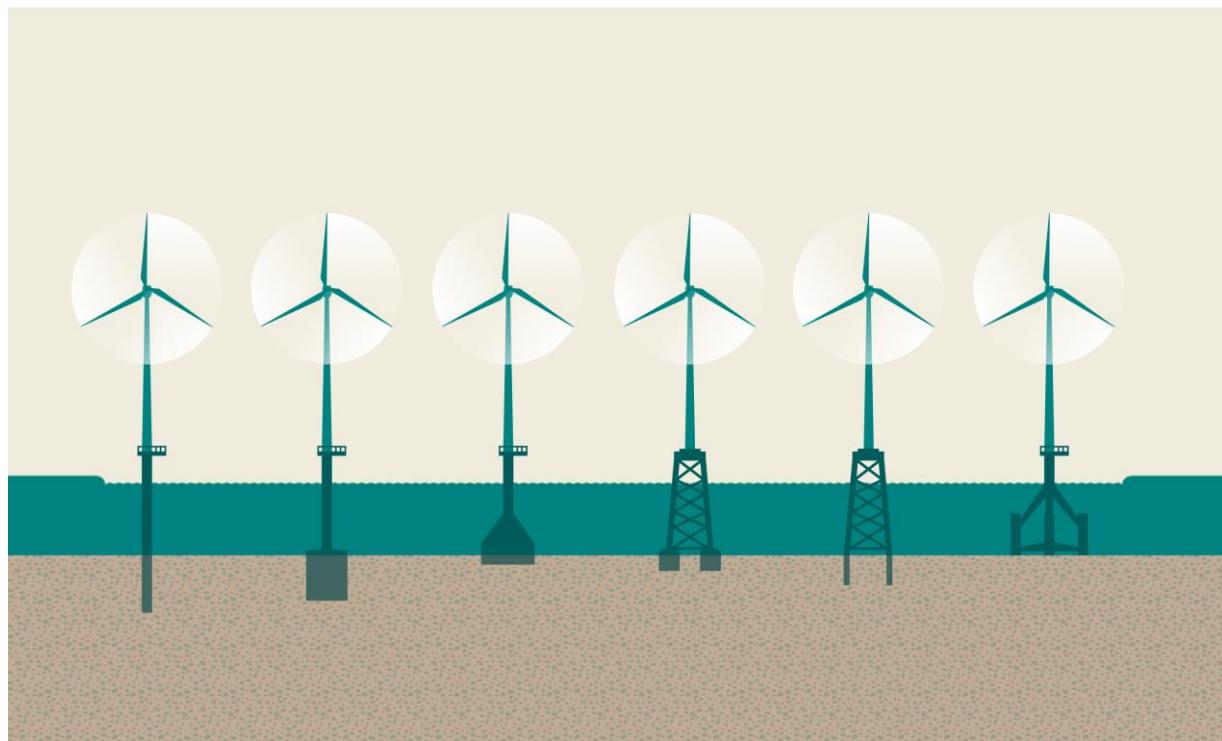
Foundations from left to right: Monopile, monopile with suction buckets, gravity foundation, jacket foundation with suction buckets, jacket foundation with pin piles and tripod foundation with pin piles. Illustrations: Fredrik Folkesson.
